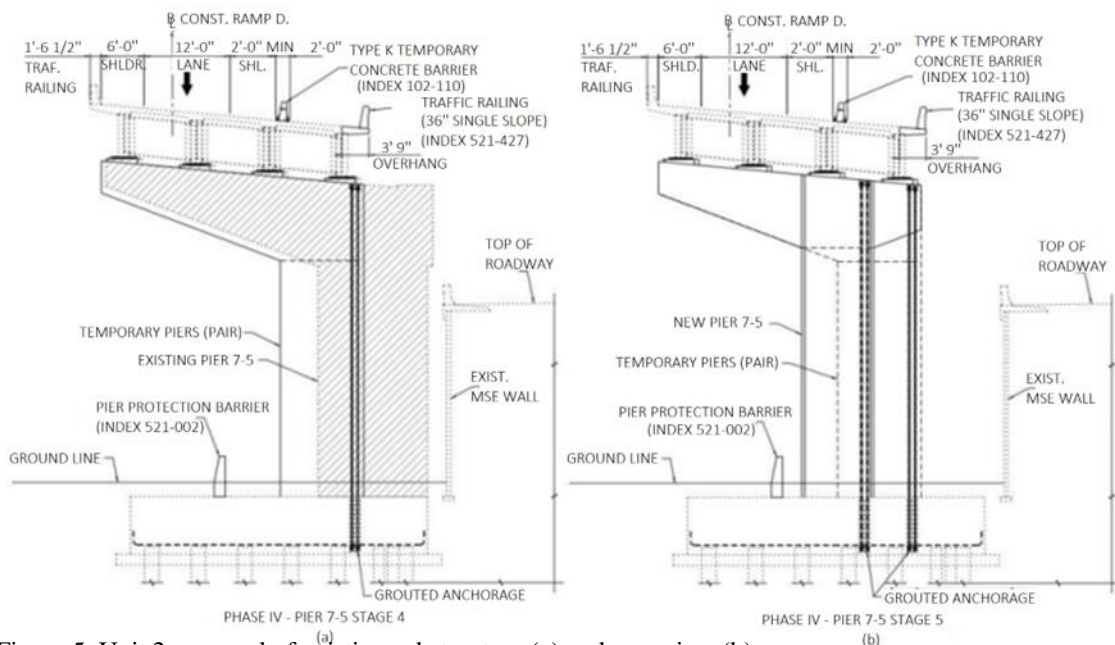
Unit 2, removal of existing substructure (a) and new piers (b)
